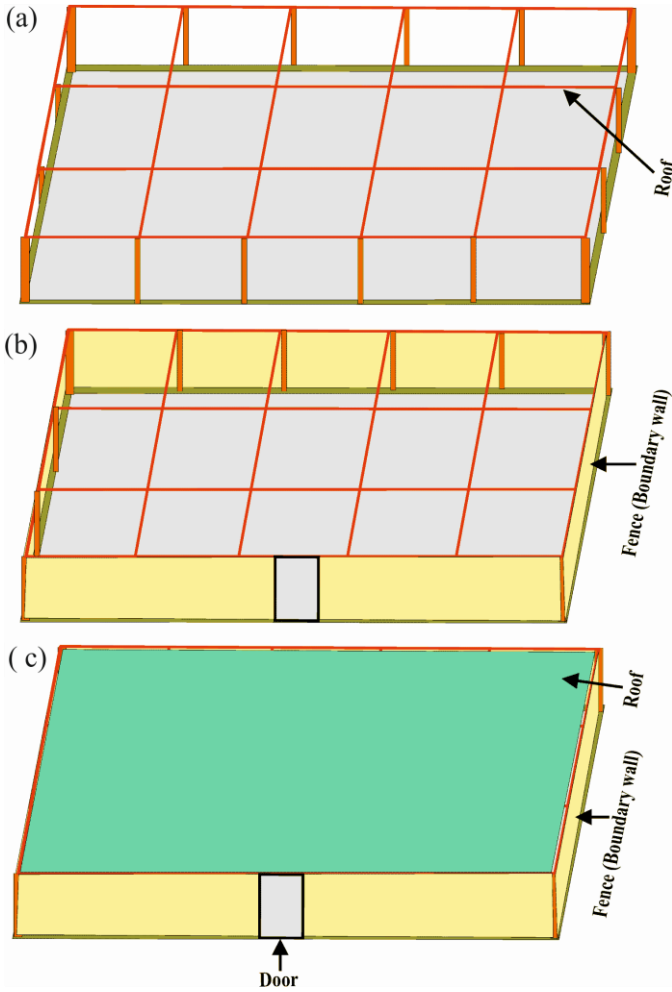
A standard sequential process (a, b and c) for constructing a typical hut like structure or “Boroj” or “Boreja” used for closed or controlled betel vine cultivation process. It shows stepwise construction of internal structure (a), fence (boundary wall with door) (b) and roof (c).
